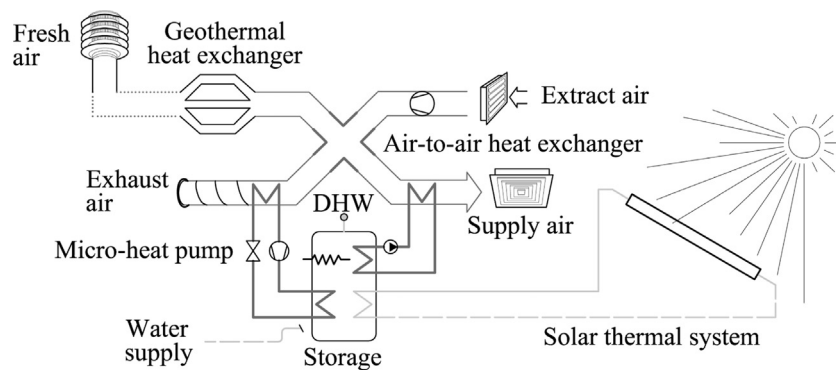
Schematic of a compact HVAC for Passivhaus equipped with a double heat exchange coil.
